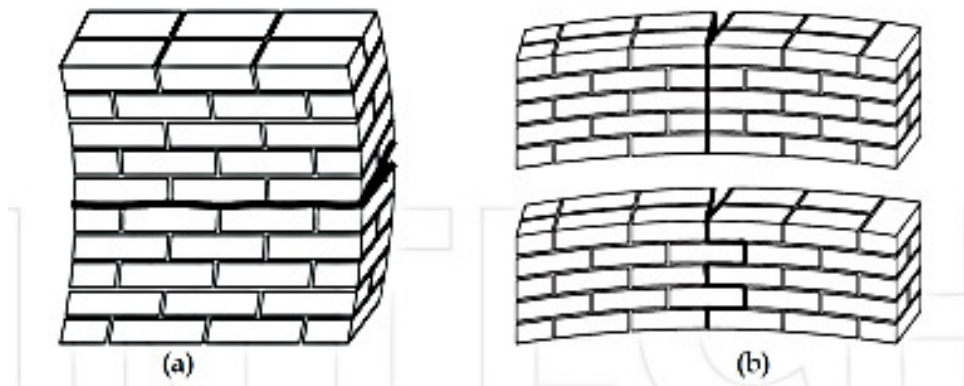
Flexural load failure (a) parallel to the horizontal joints and (b) perpendicular to the horizontal joints
